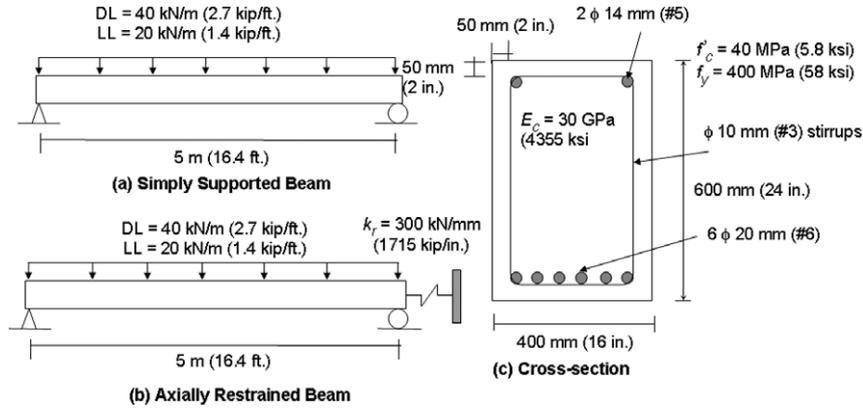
Cross-section and elevation of RC beam used in the numerical example.
